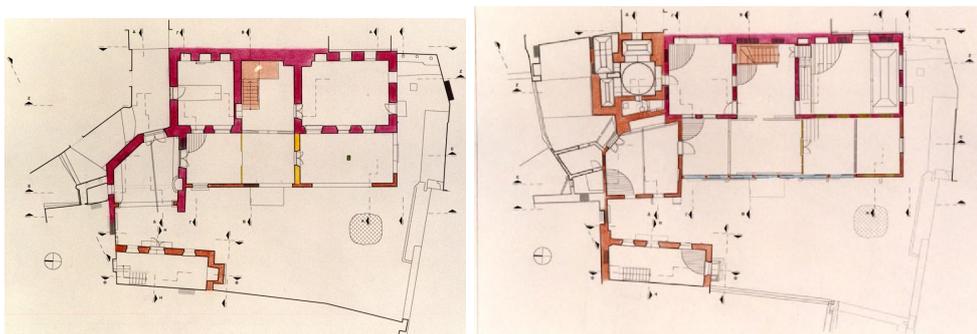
Ground floor plan and 1st floor views of Ierokleous street mansion
